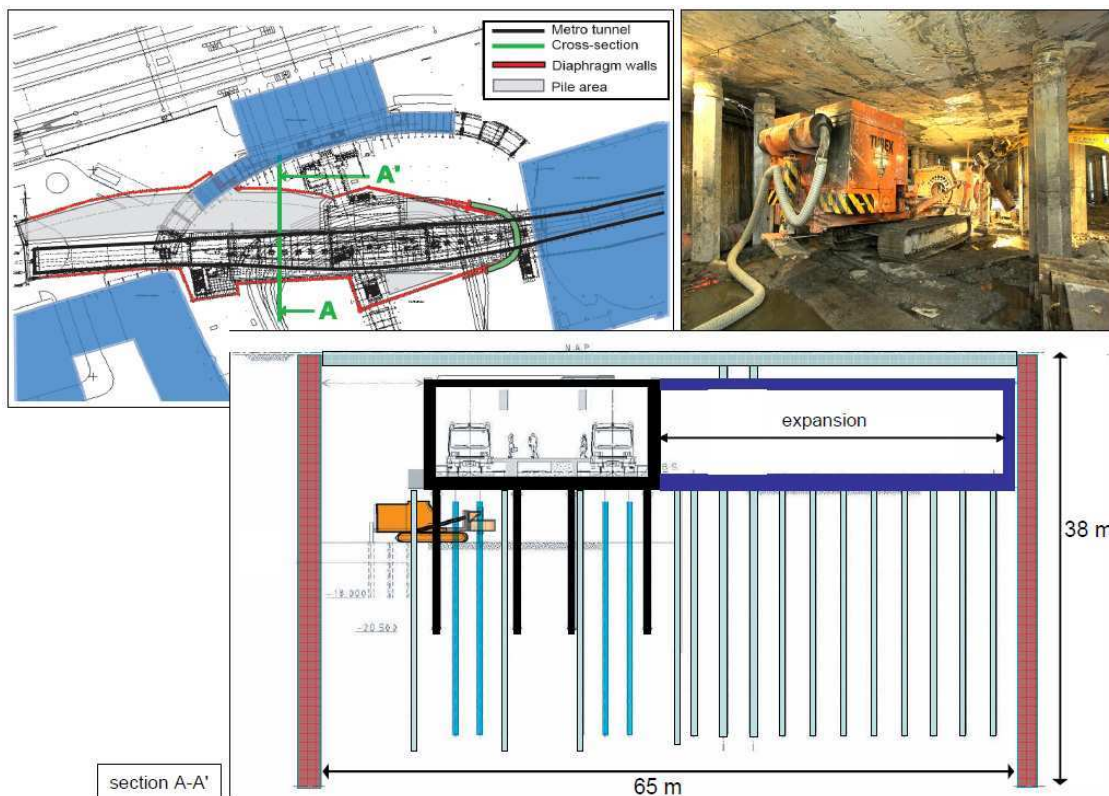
Plan view and cross section of the old metro station Rotterdam CS plus area of expansion and building pit contours, photograph of Tubex-grout injection pile installation under the old metro station
